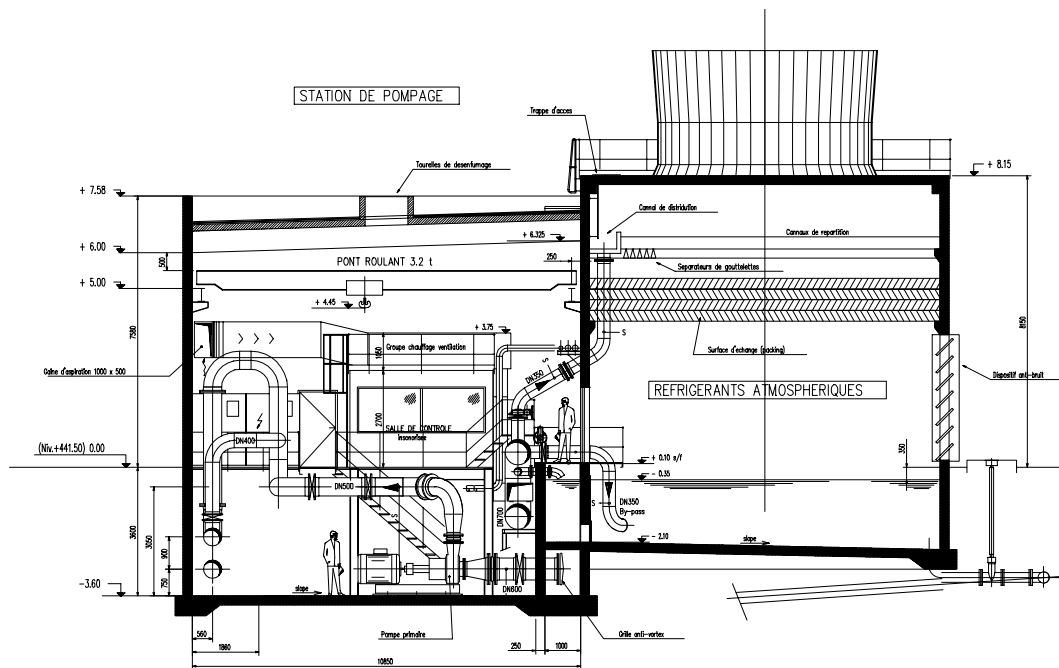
Side view of the cooling tower and primary pumping station complex (SF building).
